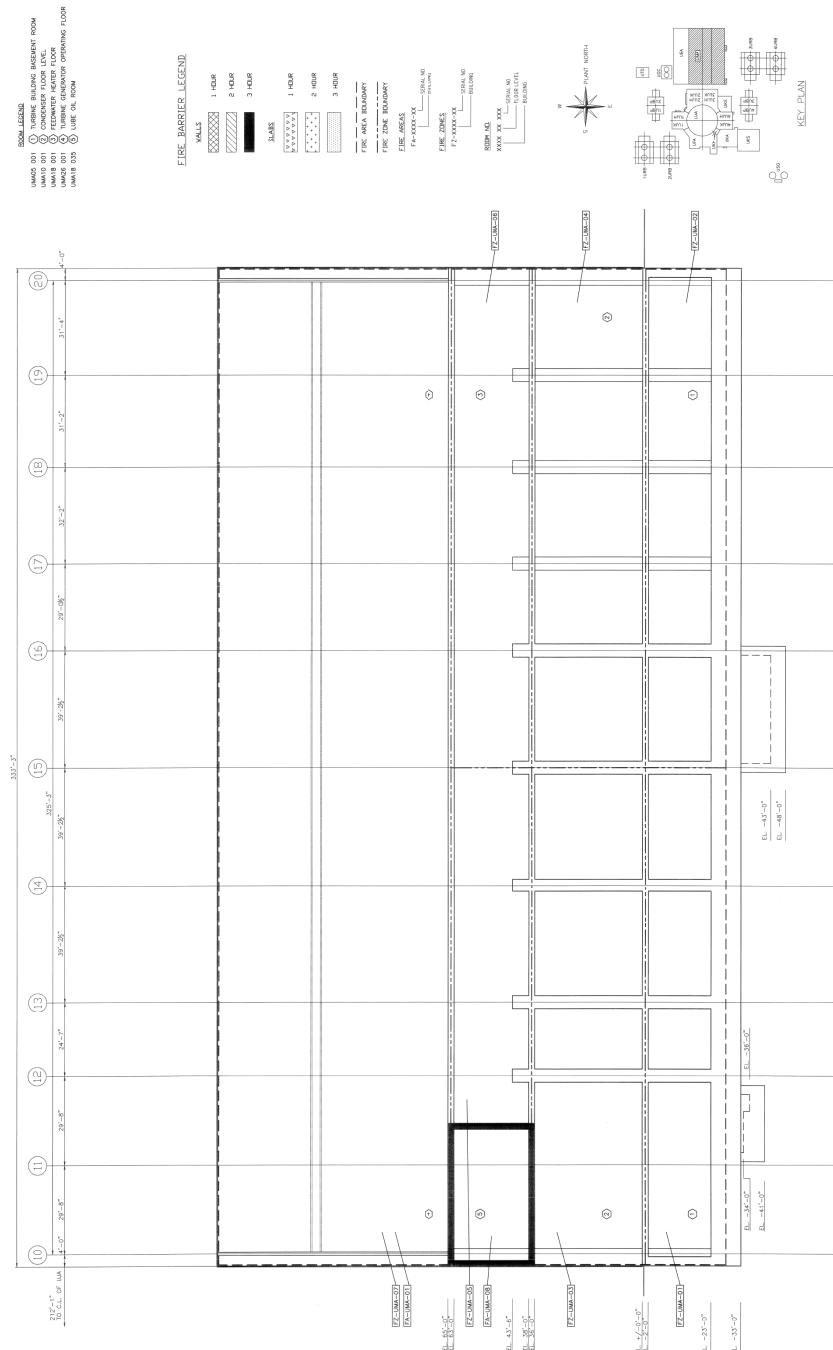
B-8—{CNPP Unit 3 Fire Barrier Location, Turbine Building Section B-B}
